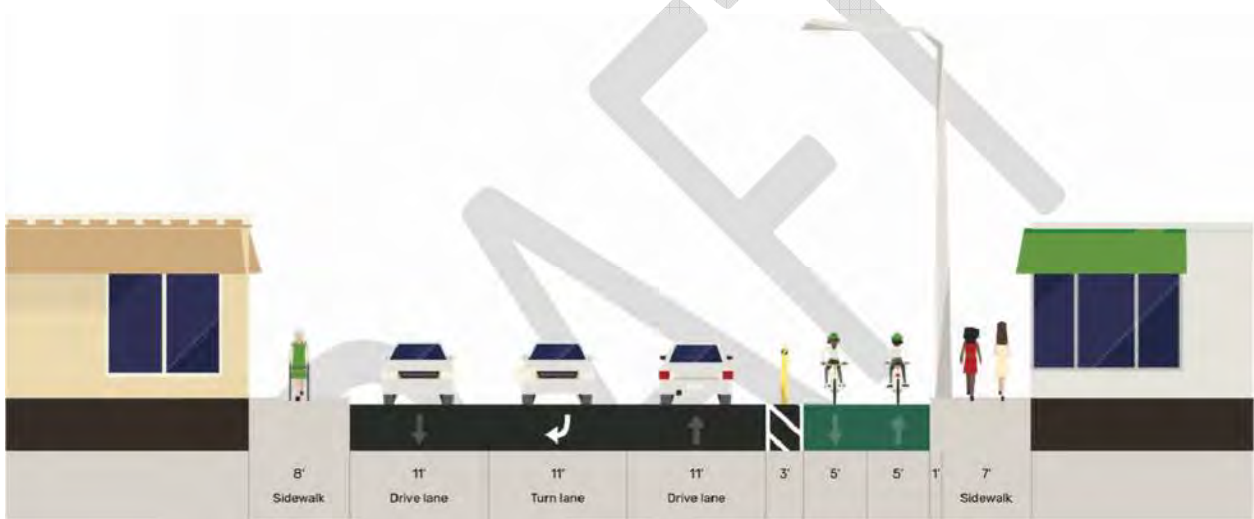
Beach Street (Eastbound) East of Industrial Rd to Walker Street
